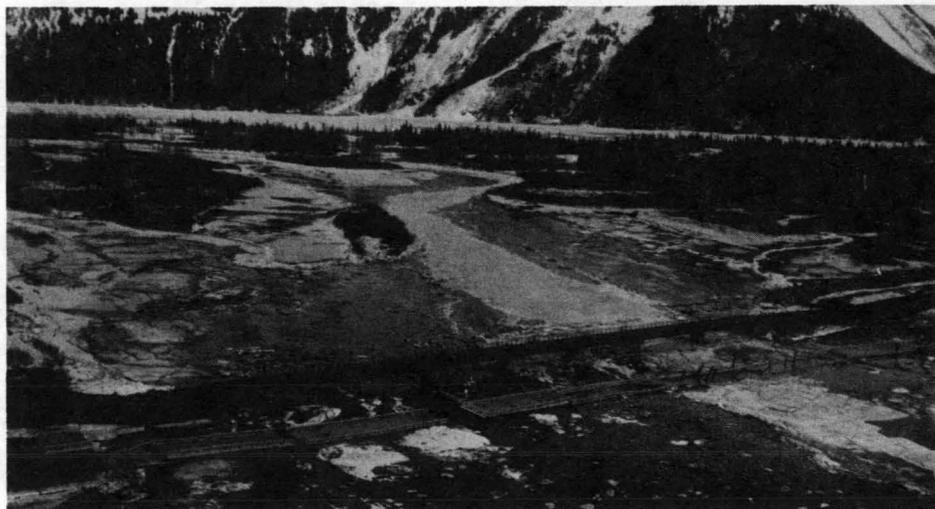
Collapsed highway bridge across Twentymile River (bridge nearest camera); a damaged but intact railway bridge is behind highway structure [after McCulloch and Bonilla (4)].
